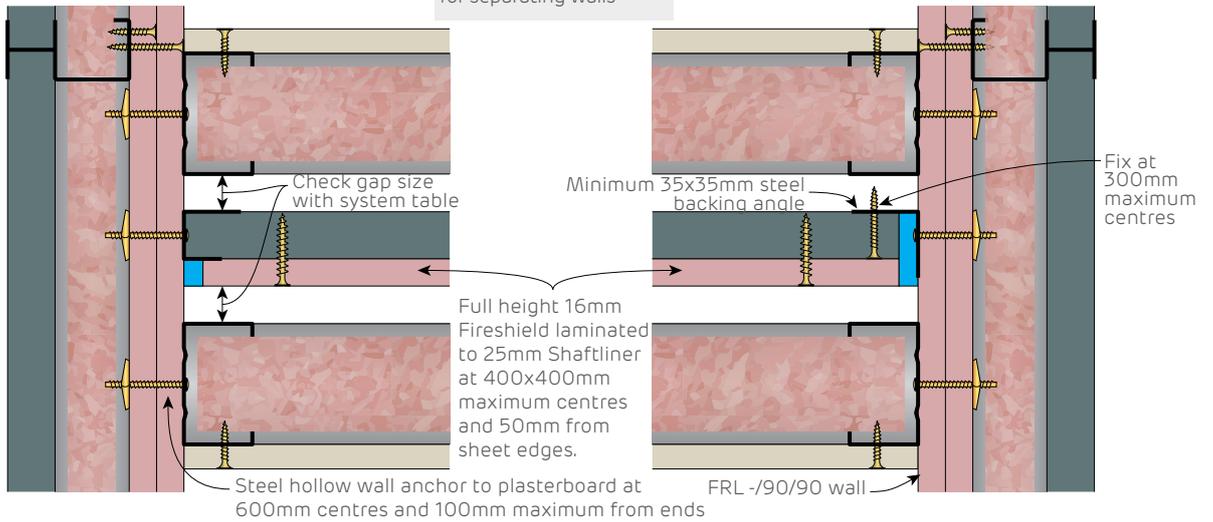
Interhome Highrise Wall to Shaft Wall
